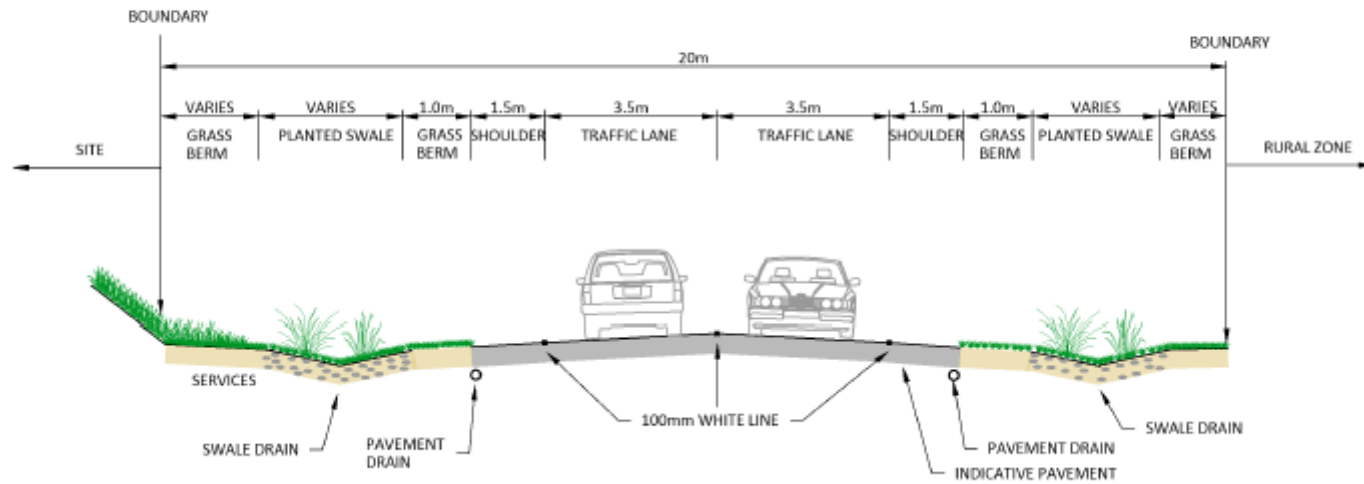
Ohinewai Structure Plan - Typical Cross-section through Tahuna Road from Access 2 to eastern Structure Plan boundary.
